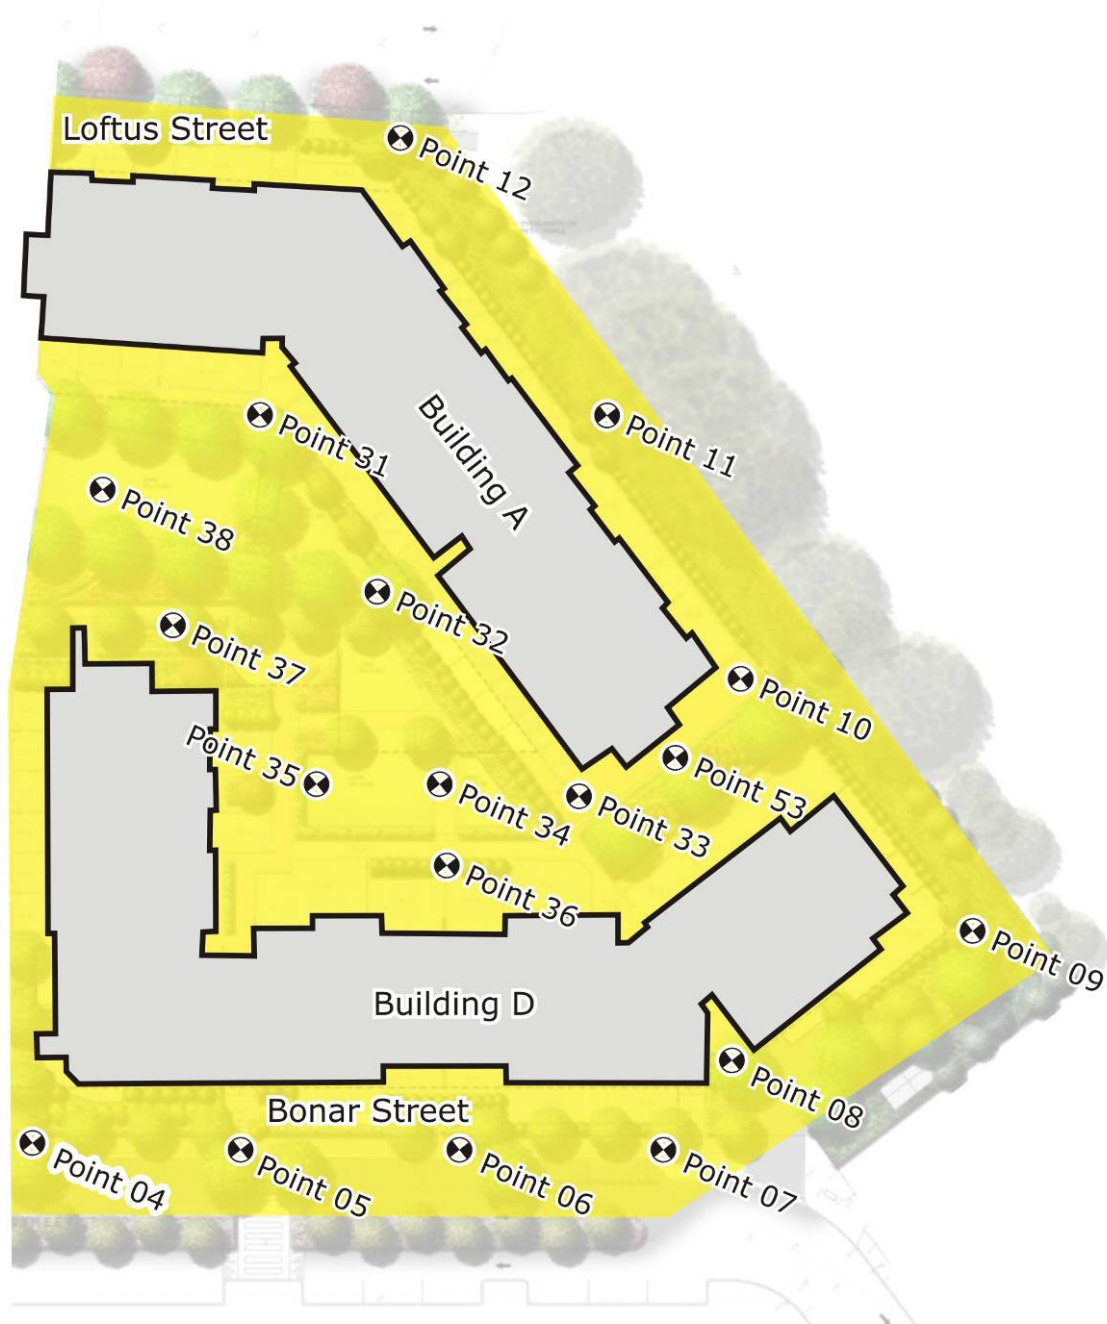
Study Point Locations - Ground Level within and around Building A and Building D (recommended wind comfort criteria also shown)
